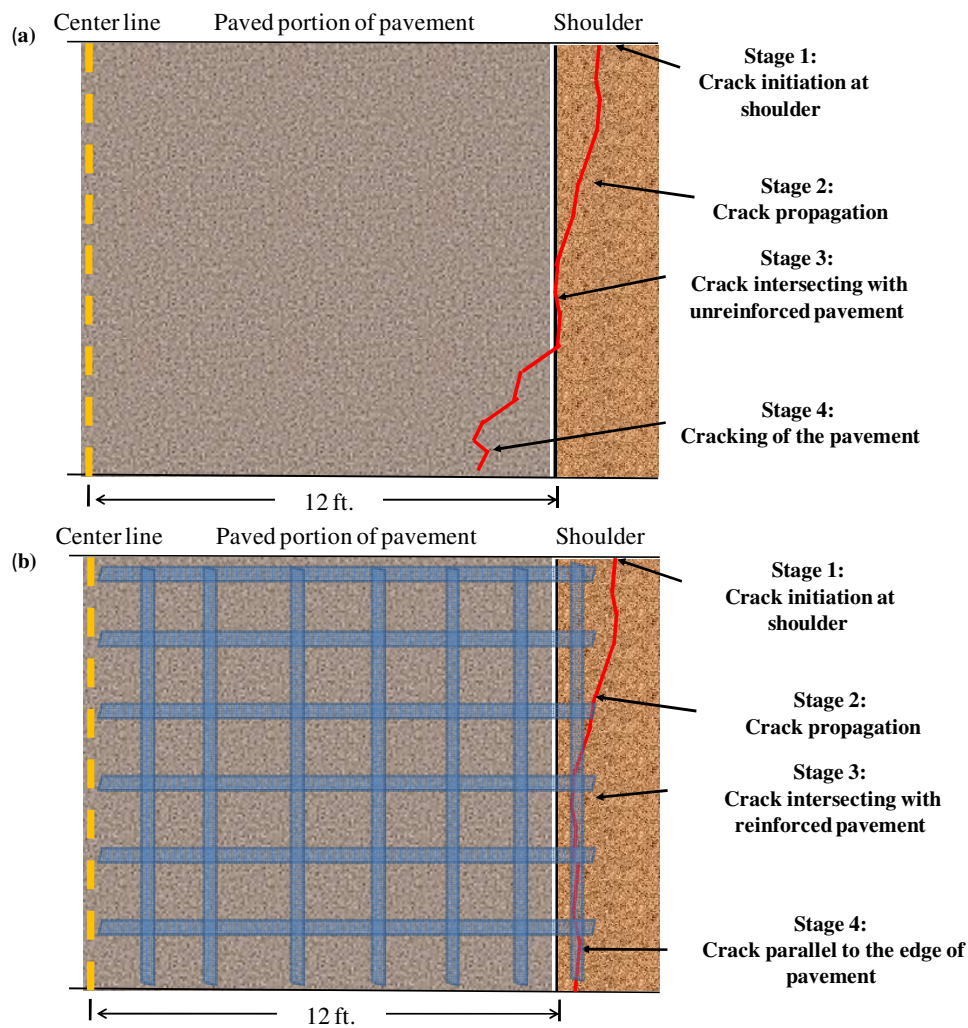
Stages in crack propagation (a) Unreinforced section (b) Reinforced section
